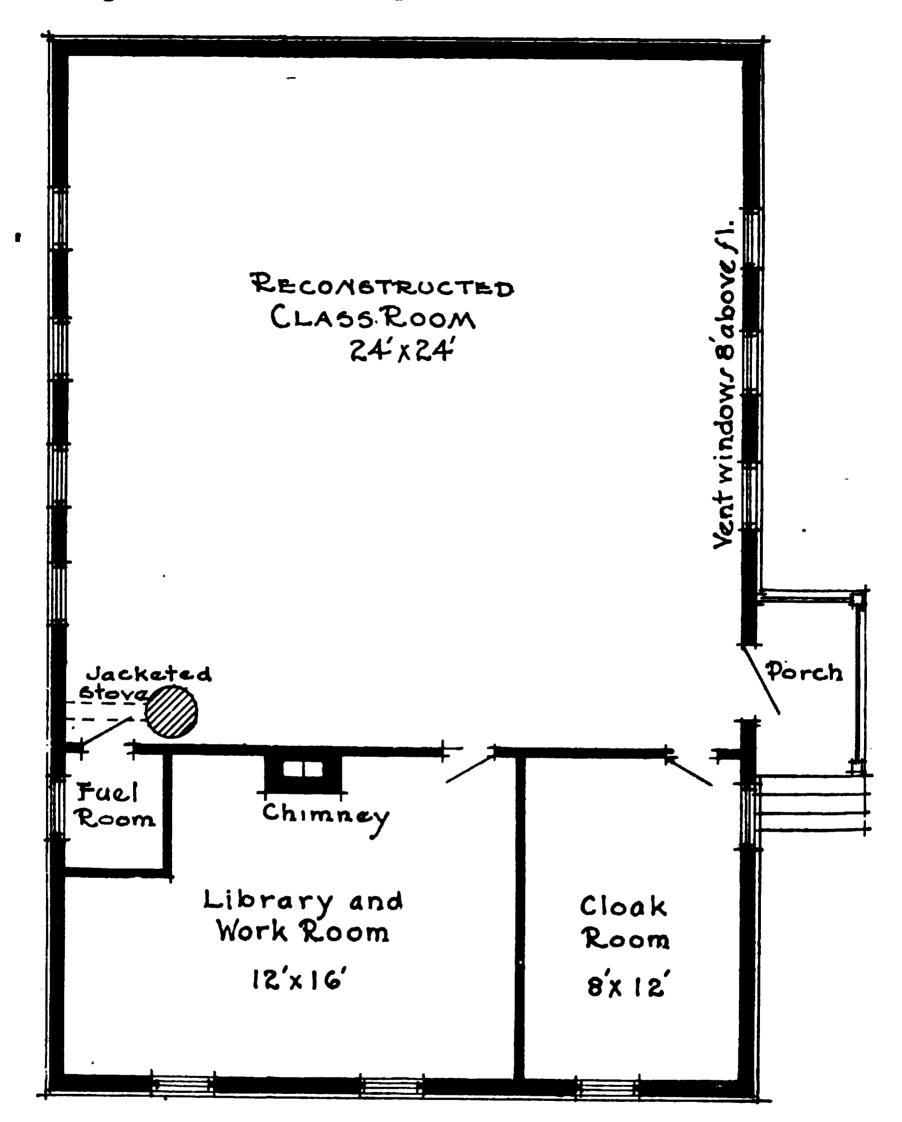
Reconstructed floor plan for an old building (based on fig. 14, p. 91).
